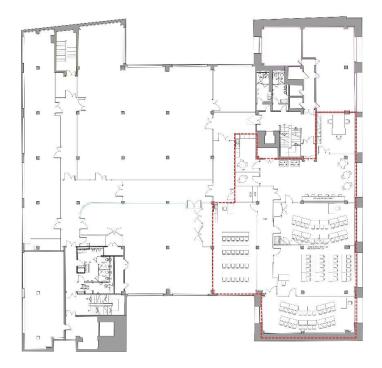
Dashed red line denotes the extent of the second floor subject to the change of use application.
